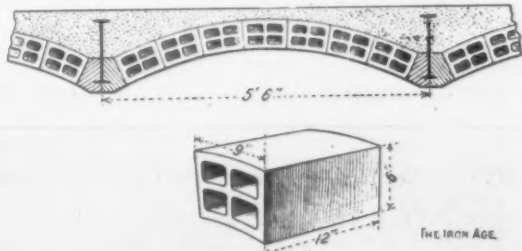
Type and approximate dimensions of segmental tile floor arch which stood the test of the fire and is generally recommended by builders who have investigated conditions at Baltimore.
